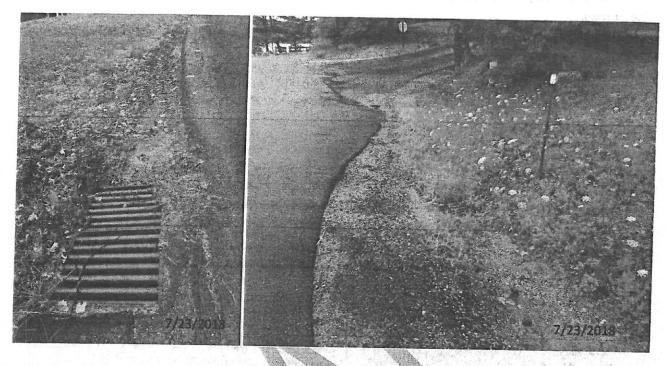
Erosion Site 09, where stormwater flows down Holt Hill Road, crosses Gregg Lake Road and washes across private beaches to enter Gregg Lake. A recently-constructed catch basin directs some of the flow under the road (left). Suggested area for installing a catch basin for remaining flow directed across Holt Hill Road, with storm drain in place (right). Ditch maintenance will be increased as needed to retain sediment.
